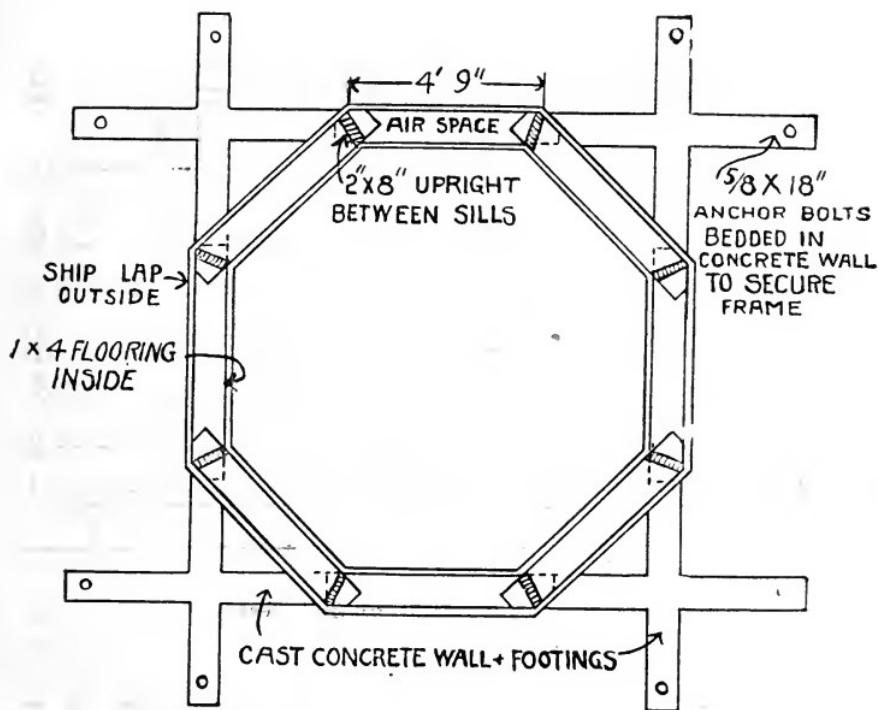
Showing foundation plan, also method of placing sill, etc.
